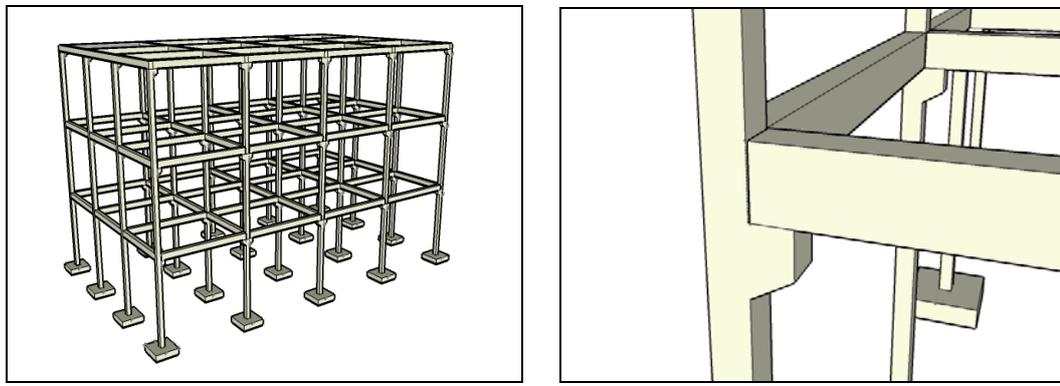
The application of simple beam-to-column connections in precast concrete skeletal frame.
